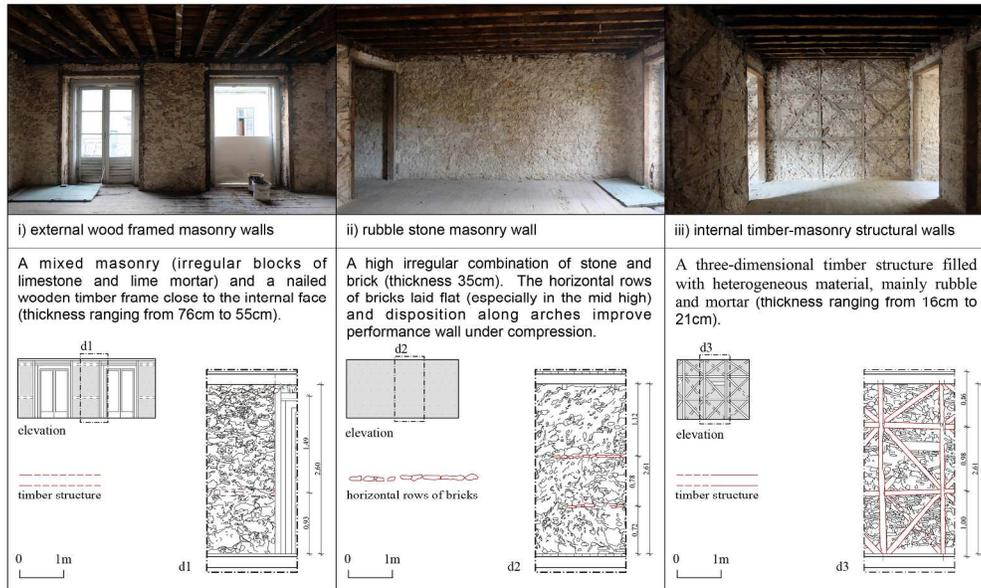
Pombalino case study: i) external wood framed masonry walls; ii) rubble stone masonry wall; iii) internal timber-masonry structural walls
